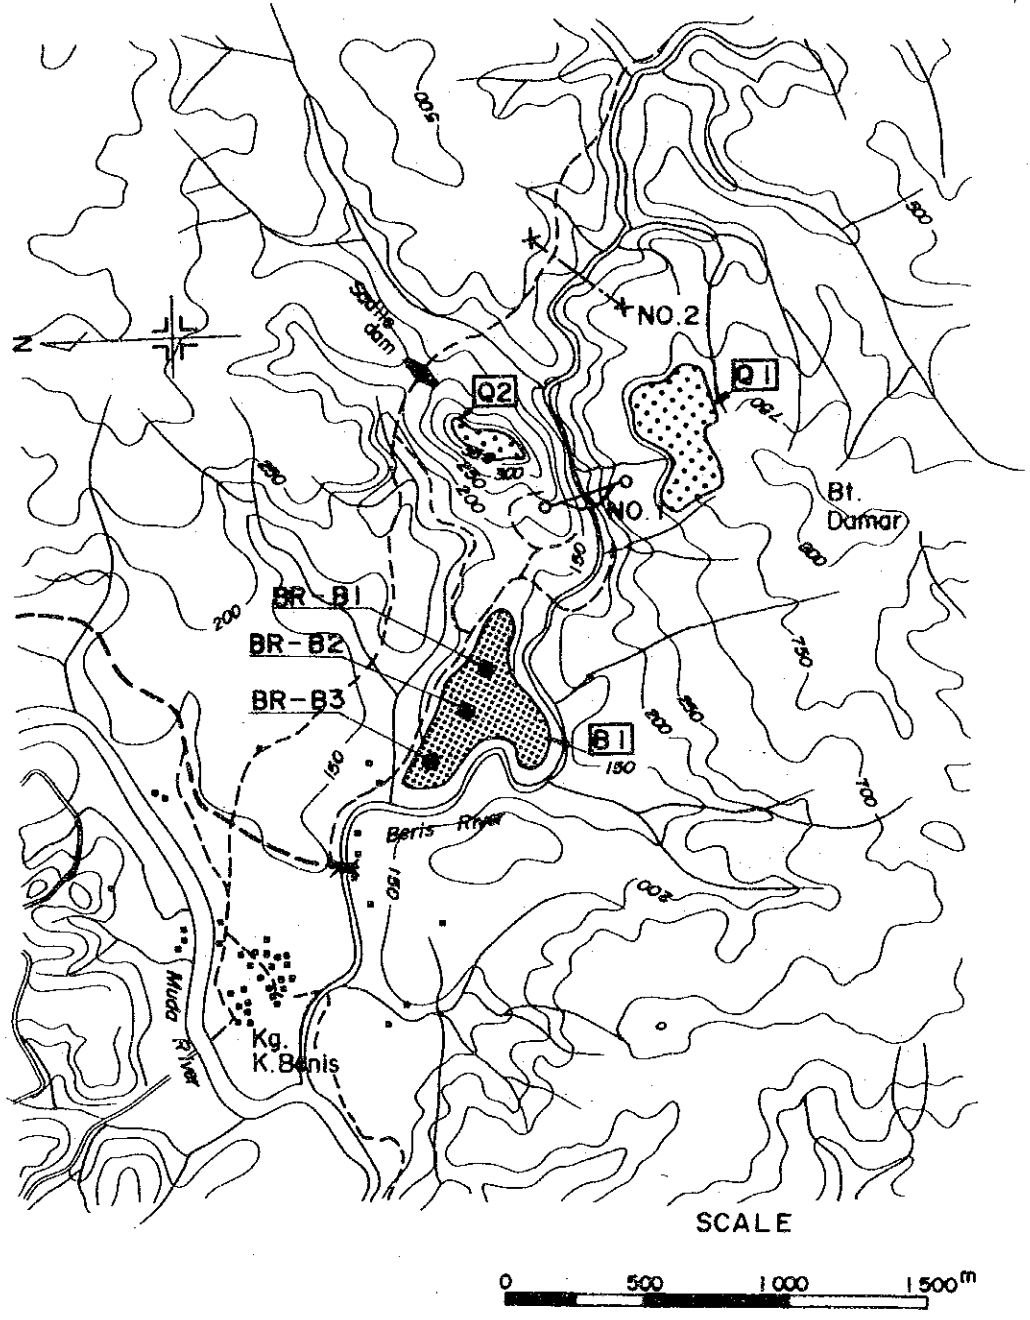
Detailed Construction Material Sources Around Beris Dam Site
